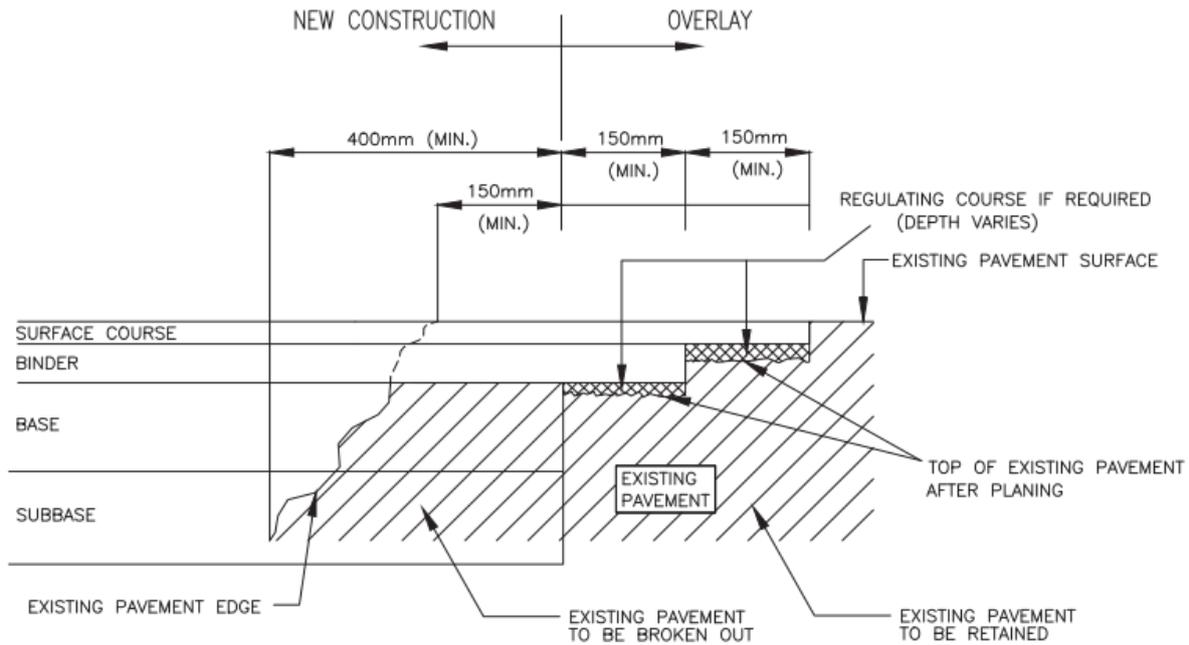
TII - Typical Road Section Longitudinal Tie-in with Existing Road
